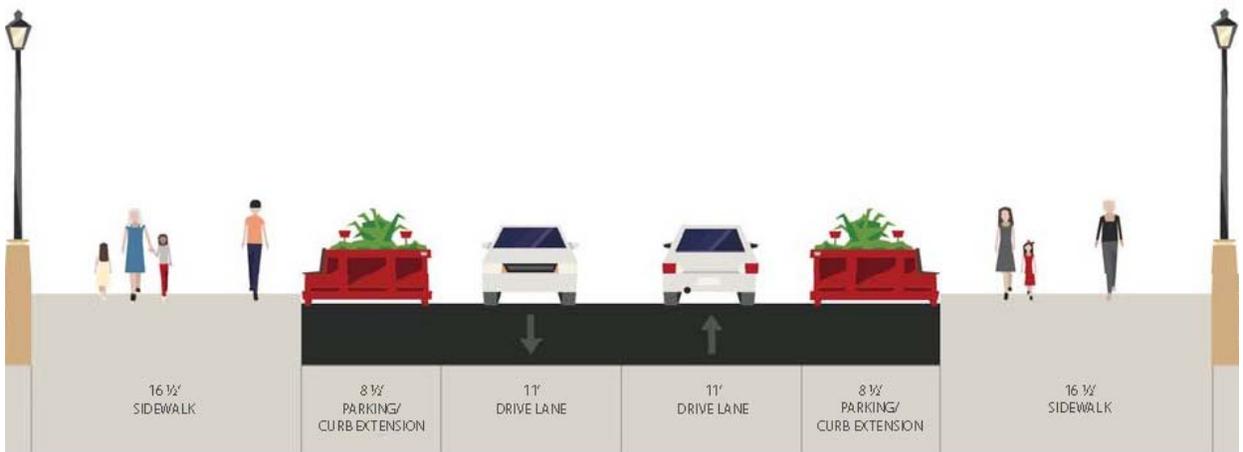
PROPOSED SECTION OF ELM STREET BRIDGE
